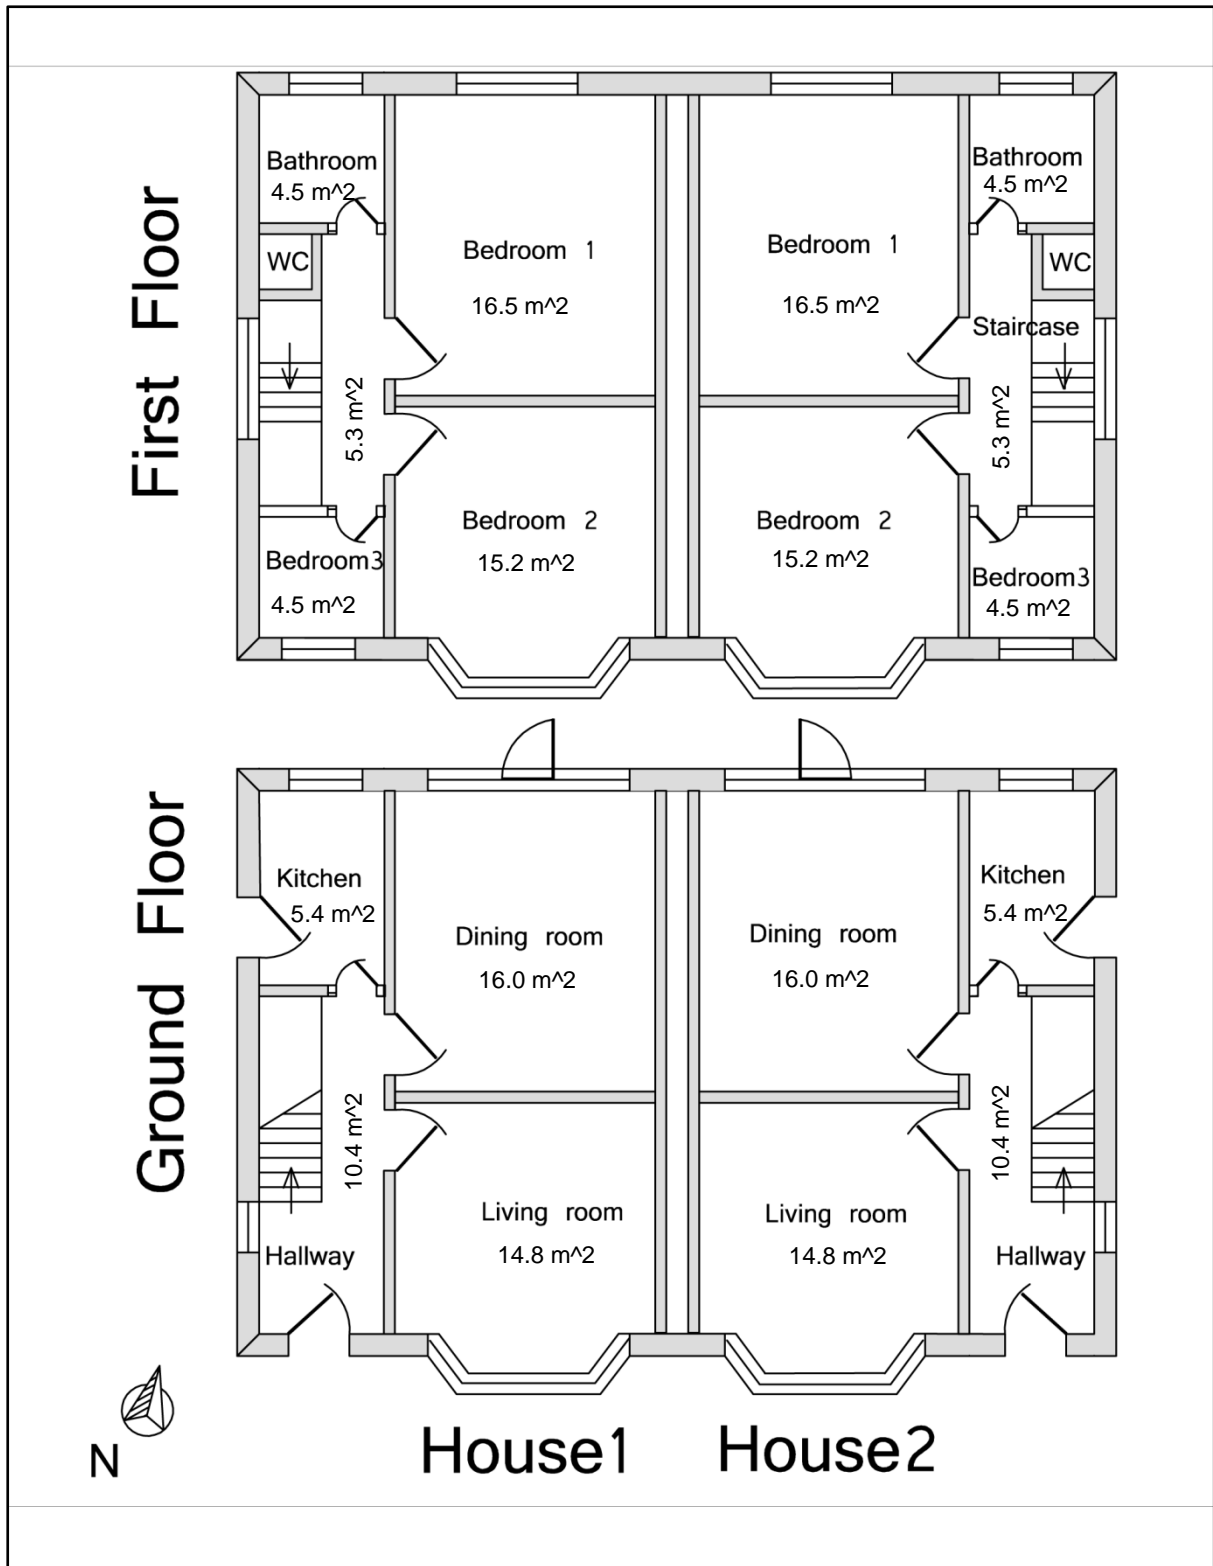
The floor plans of the test houses⁵ with the floor area of each room
